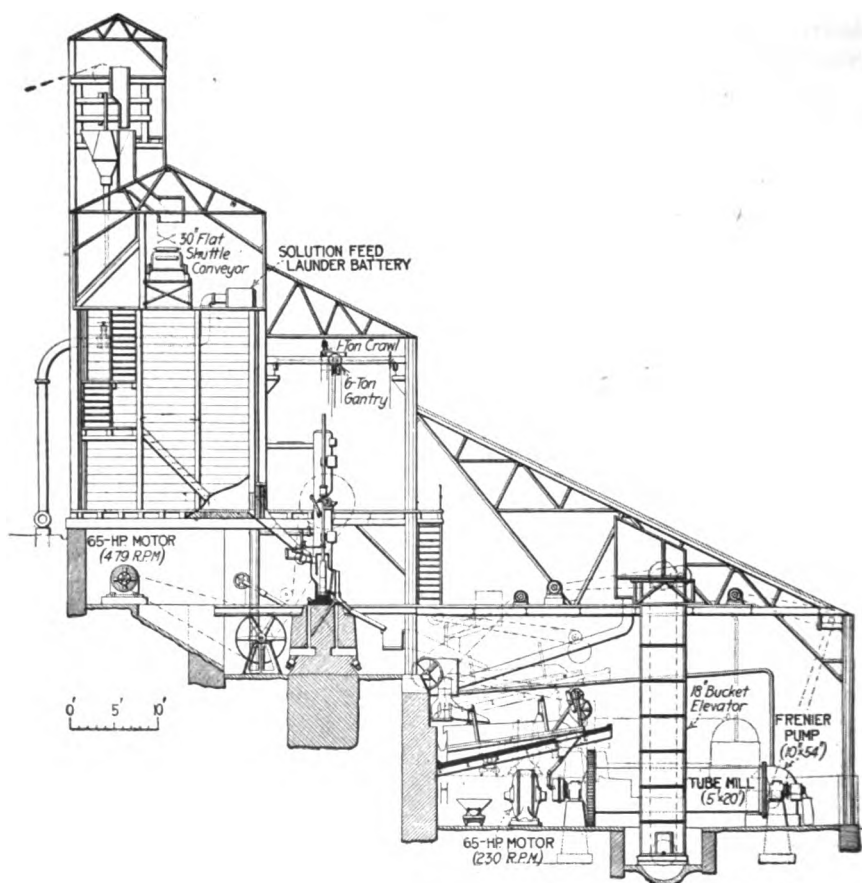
STAMP MILL. SECTIONAL VIEW.
